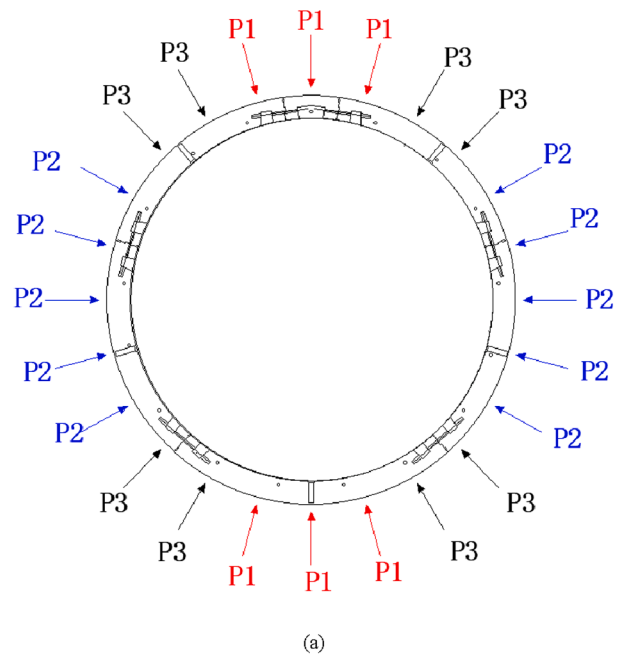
Cross-section of the unstrengthened segmental tunnel lining (unit: mm).
